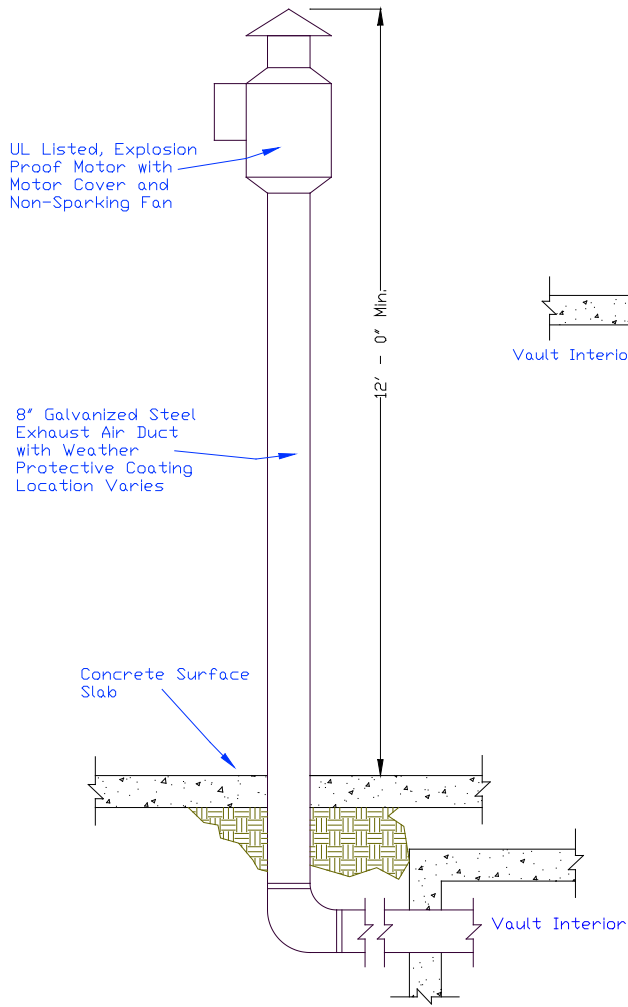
End Sectional View of Typical Vaulted AST
